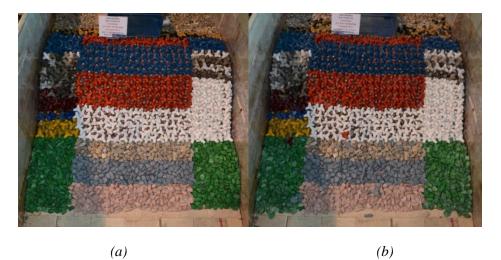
(a) and (b) The views of section before and after the experiment.
